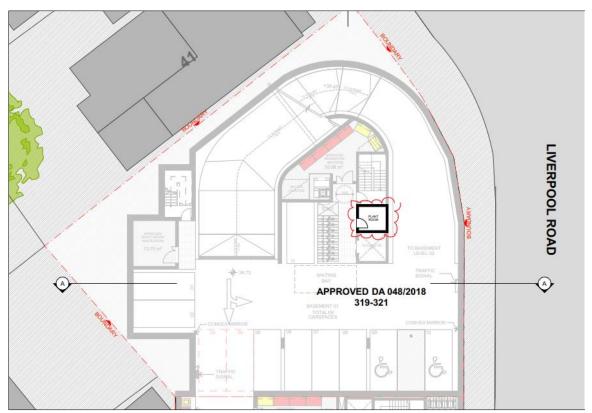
Basement level 1 floor plan. Source: Ghazi Al Architect (2024).
